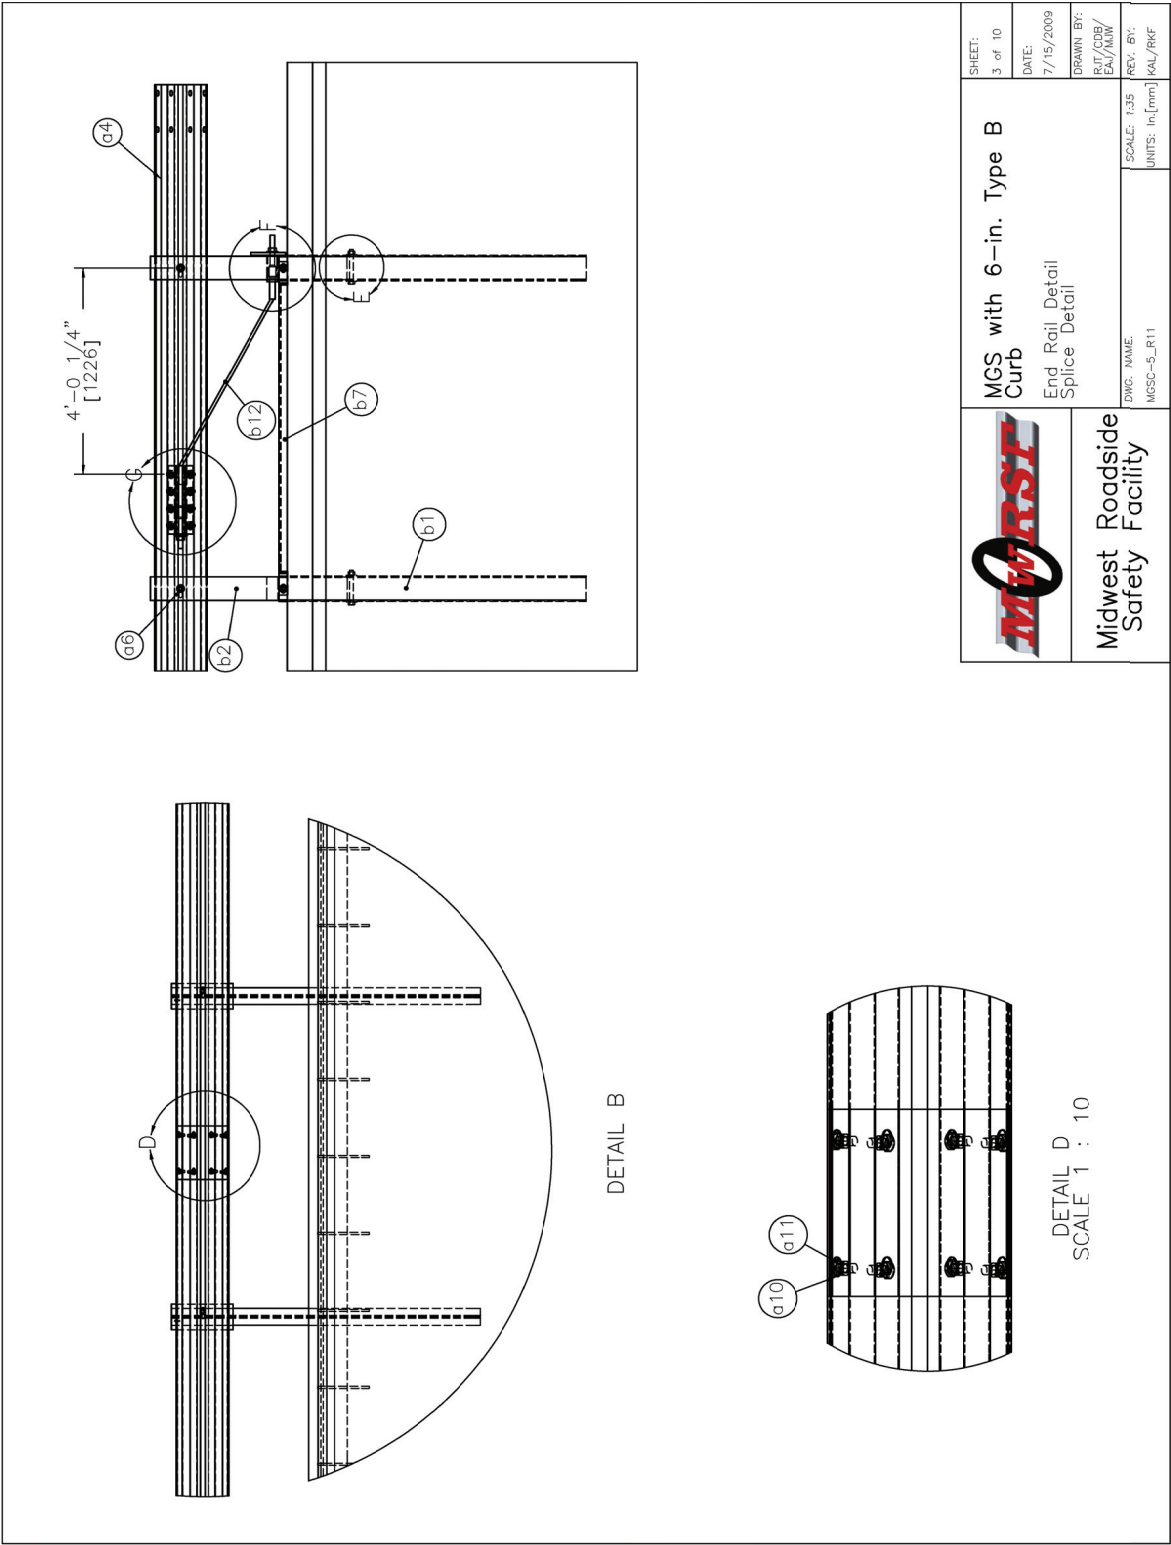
End Rail and Splice Details, Test No. MGSC-5
